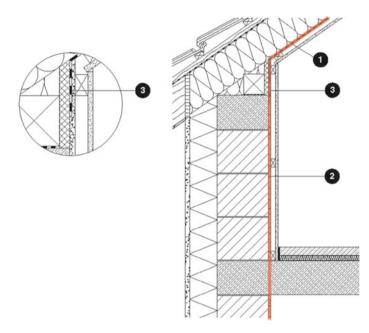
Wall/ceiling: (1) air barrier, (2) interior plaster, (3) adhesive, tape, plaster base
